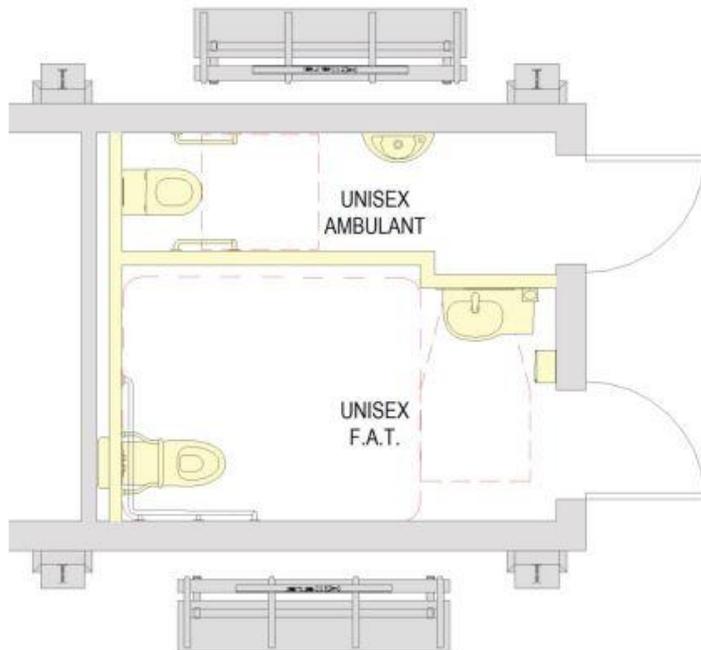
Existing layout and demolition plan for existing toilets (Aurecon, 2021, provided by Transport for NSW)
